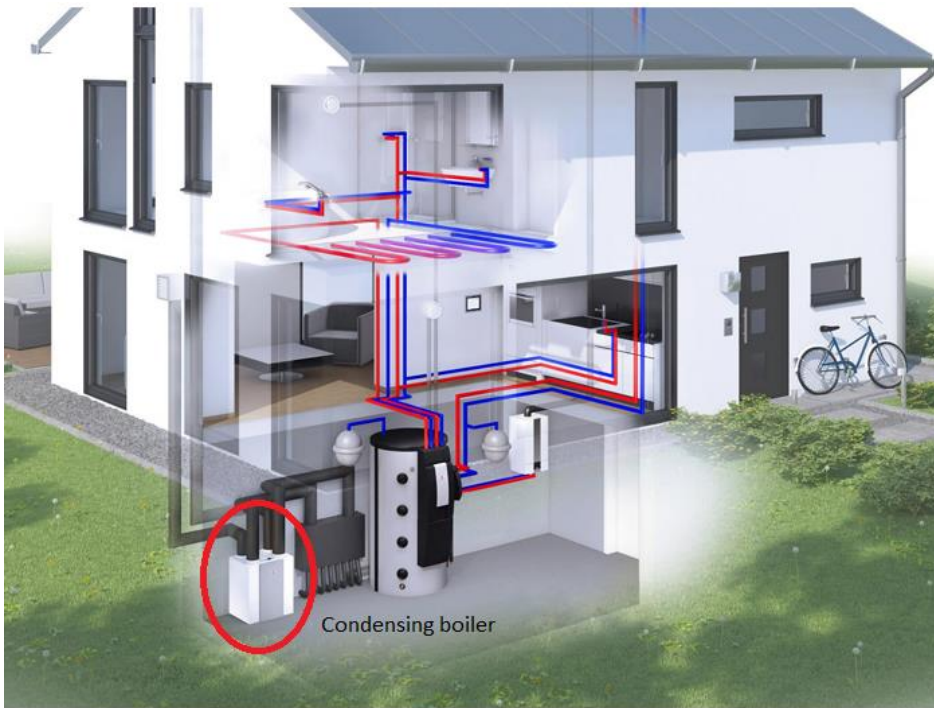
Schematic drawing indicating possible location of the boiler room with boiler and external hot water tank.
